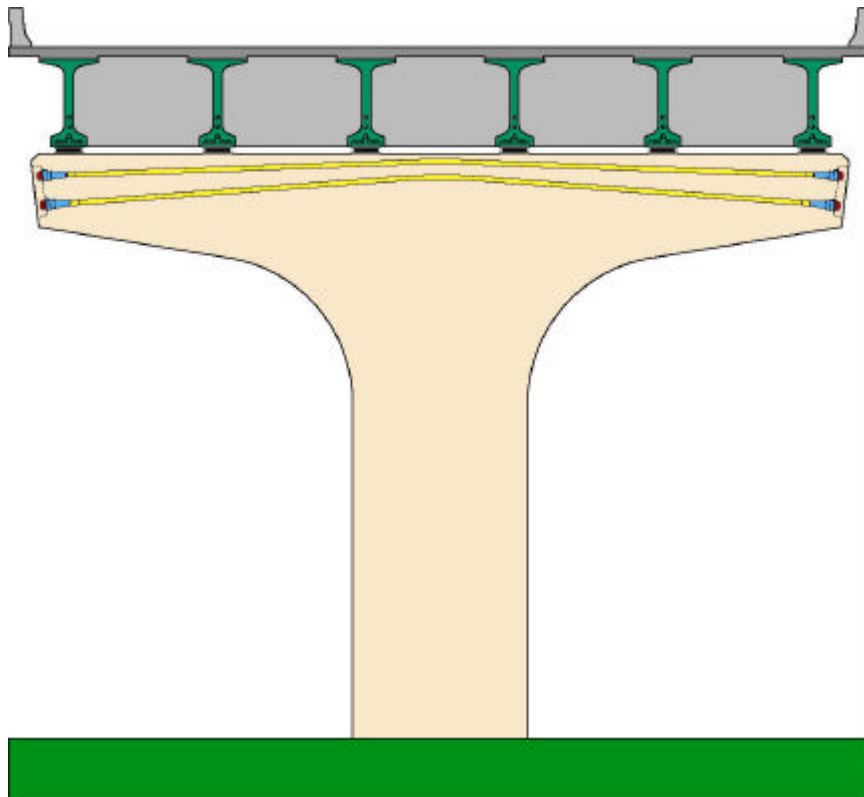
Post-Tensioning in Hammerhead Piers
